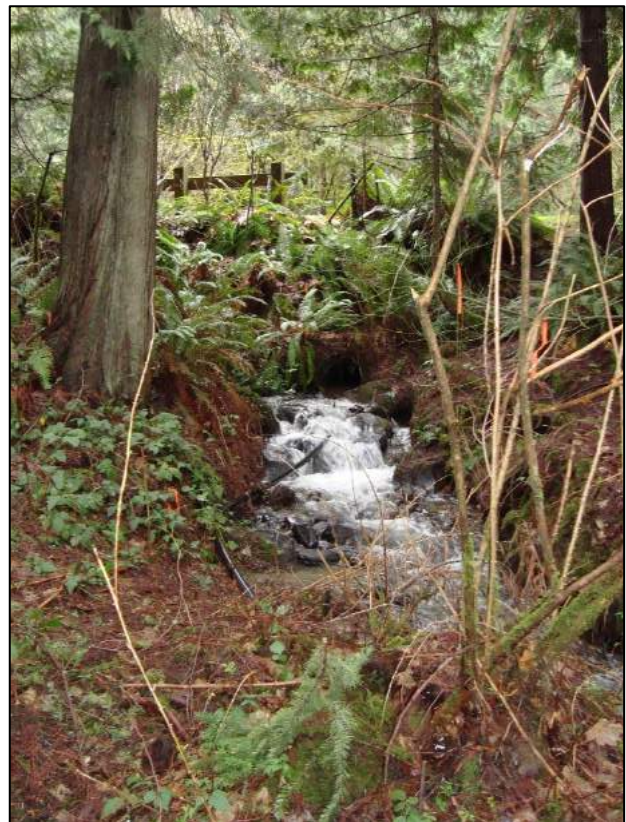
Channel downstream of 206th Avenue NE. Road crossing is at guardrail shown at the top of the photo. Large rip-rap in channel prevents erosion downstream of culvert crossing. January 12, 2018.
